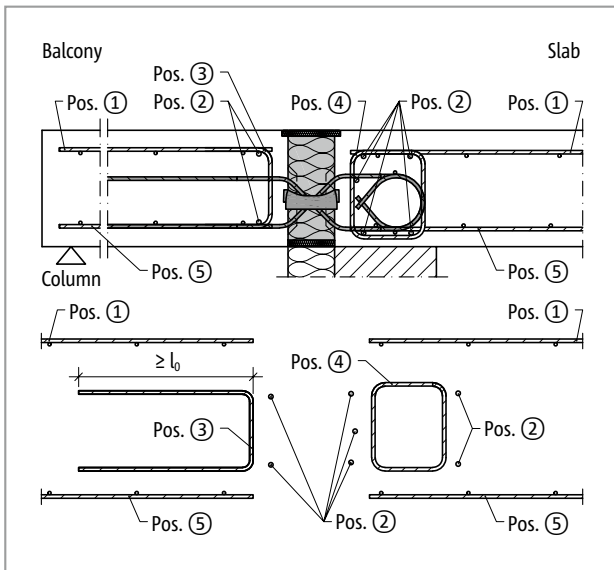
Schöck Isokorb® T type Q-VV1 up to Q-VV5: On-site reinforcement
